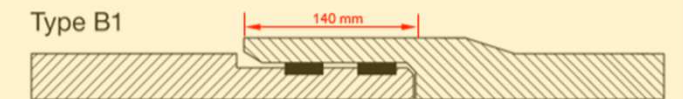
Joint type B1, flexible bell and spigot system with double gasket
